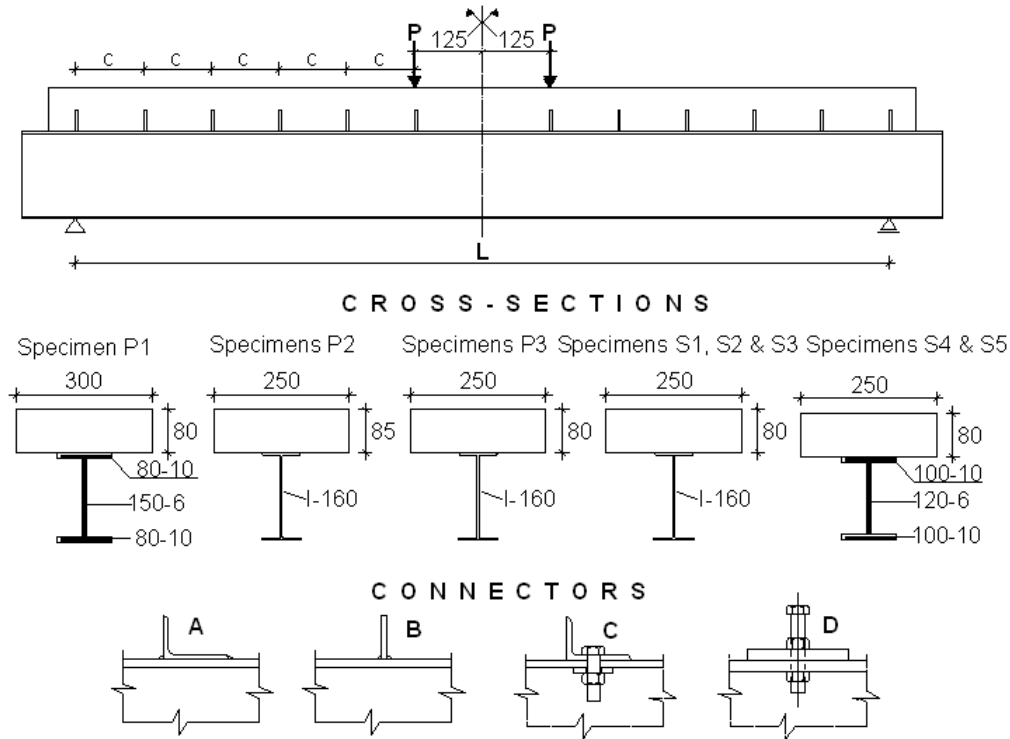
Main dimensions and load arrangements of the investigated steel-concrete composite girders. Measures in millimetres.
